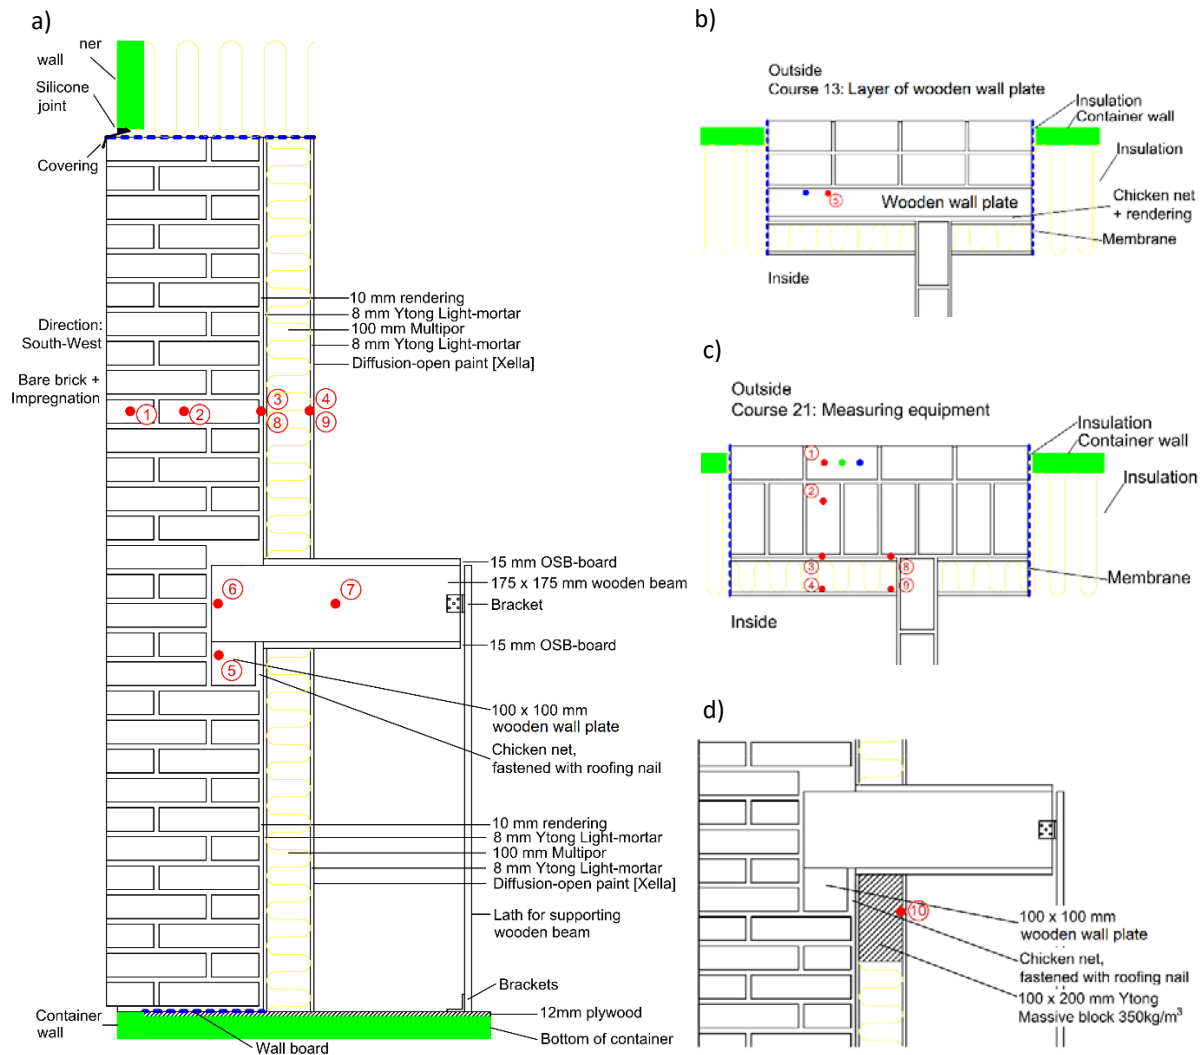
Sensor points: a) Vertical section of a test wall. b) Horizontal section through the 13th brick course. c) Horizontal section through the 21th brick course. d) Vertical section through the deliberate thermal bridge. Source: Tommy Riviere Odgaard
